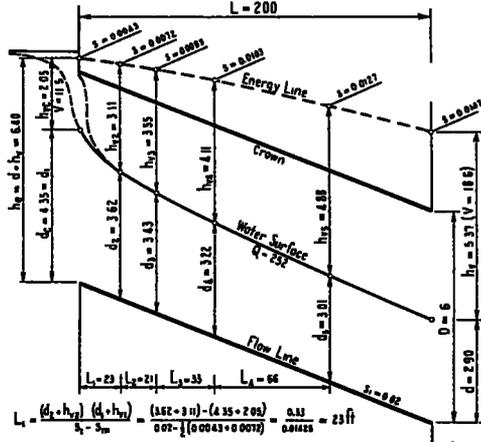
Application of Table 4 and Formula for Non-uniform Flow to 72 in. RC Pipe Culvert with Free Outlet
